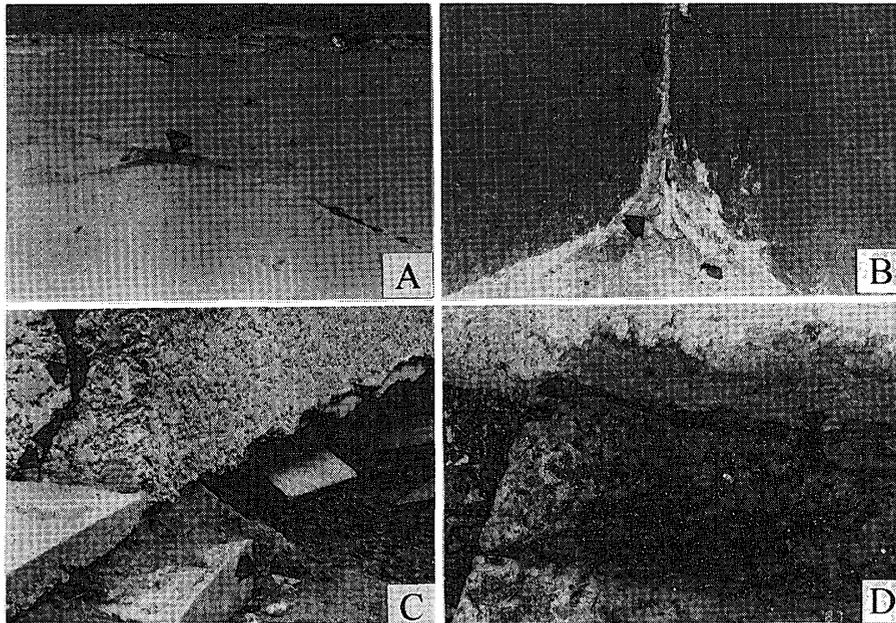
Termite shelter tubes penetrated through cracks in concrete floor and wall due to an improper construction which observed from 4 cases inspection; slab on ground (A and B) and crawl space house (C and D).
